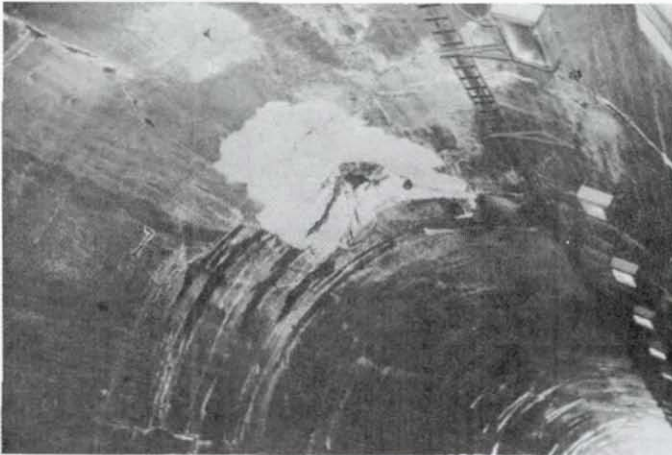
FAILURE OF LINING CONCRETE NEAR ARCH CROWN AT TOMORO TUNNEL (HIGASHI-IZU TOLL ROAD)
